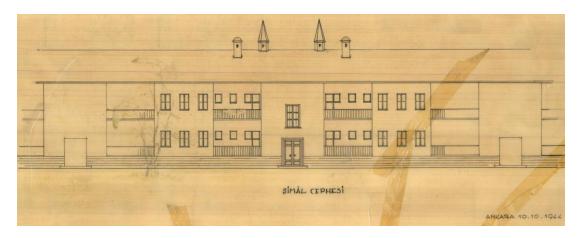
The original drawing of the double storey dwellings of officers, the north elevation, scale 1/100, Construction Section in General Directorate of TEKEL, 10.10.1944 (Source: TTA Archive)
